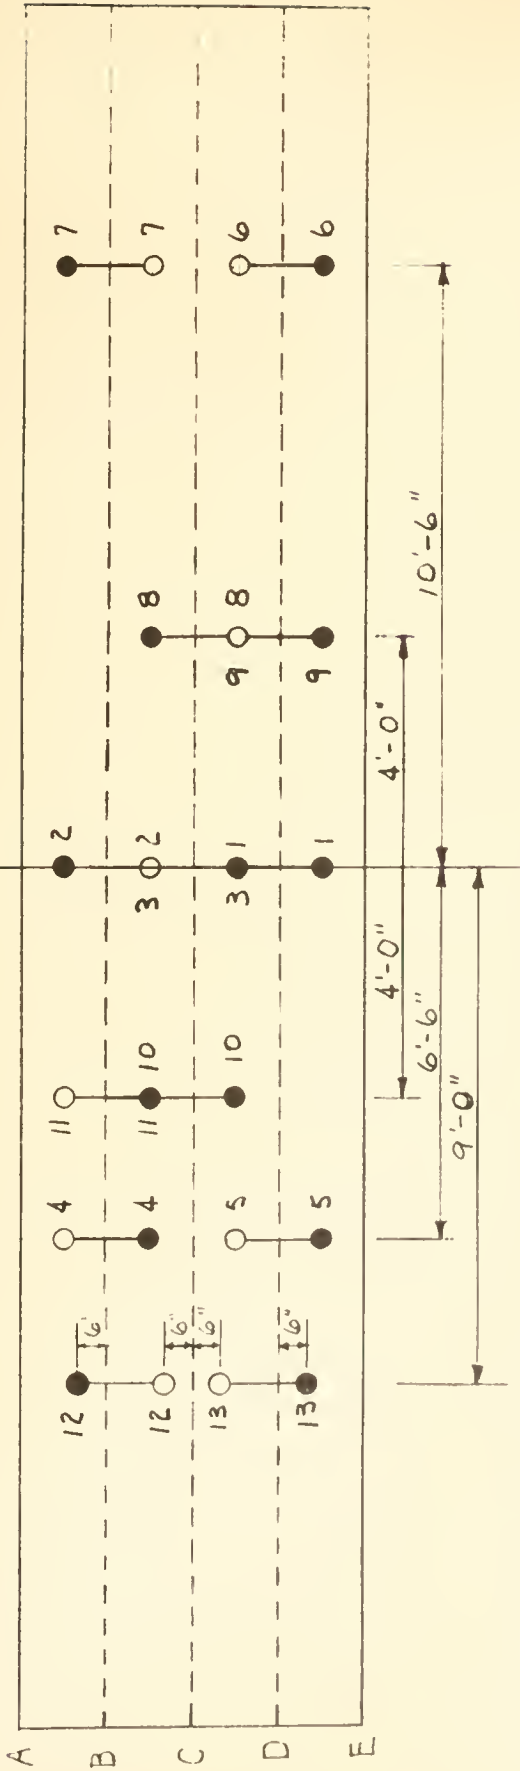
YIELDING OF SLAB REINFORCEMENT, BRIDGE N30
